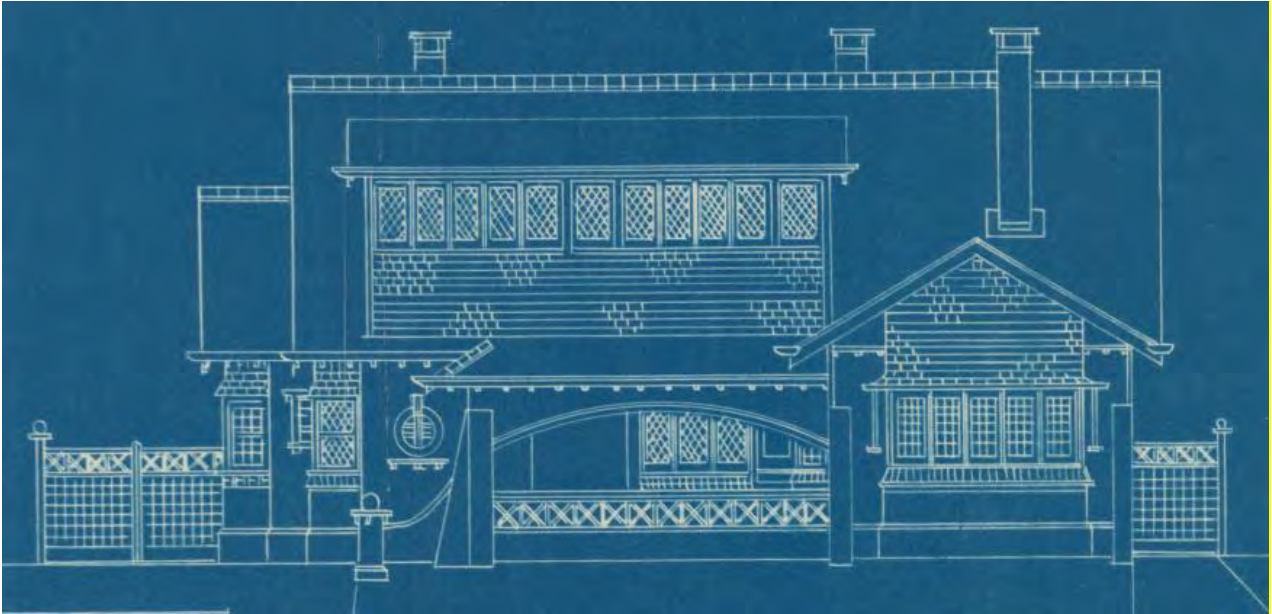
Plan of villa residence for E. Shephard Esq, Normandy Road, St. Kilda (east elevation).
